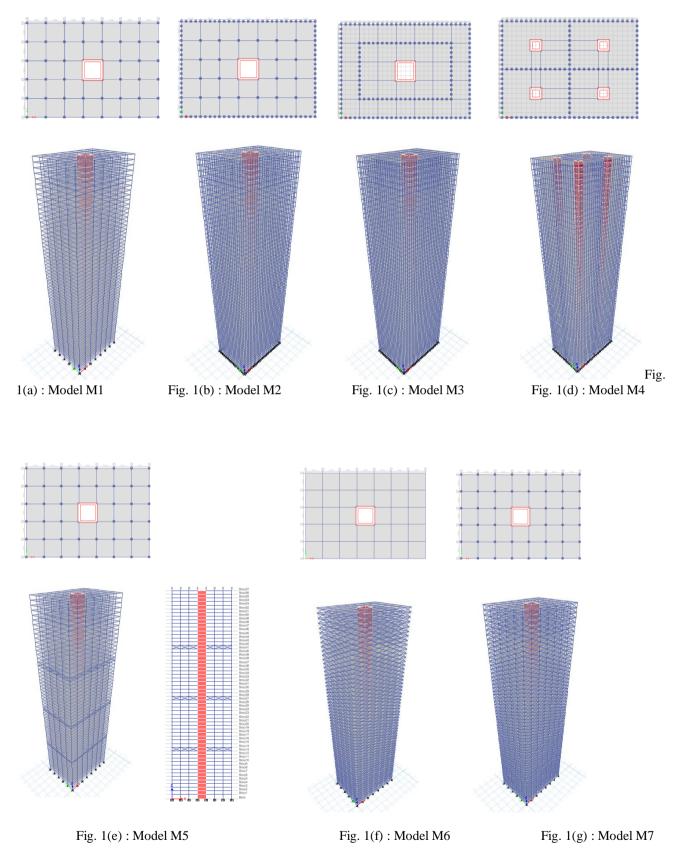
Plan and 3D views of all the developed models with different tall structural systems
